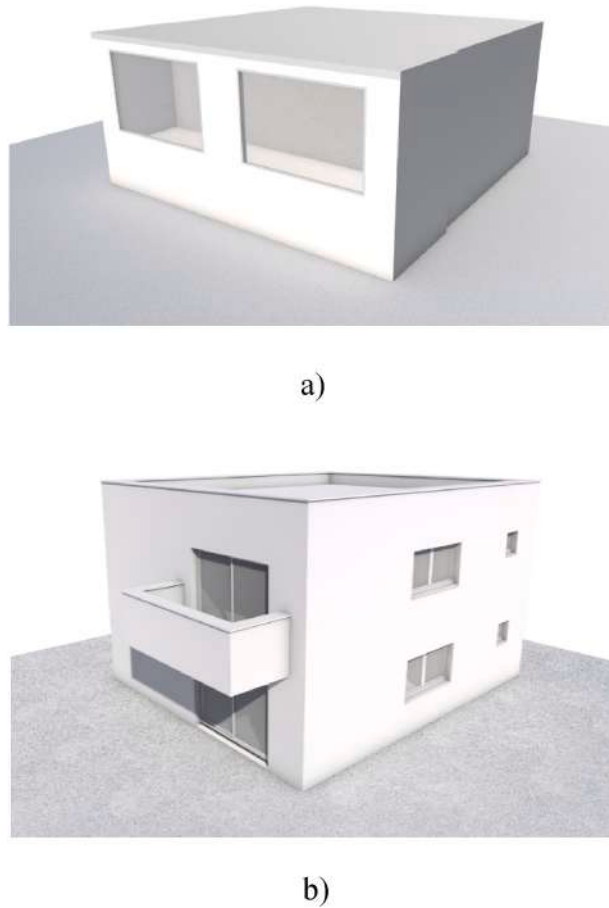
Archicad 3D models; a) simple building, b) multi-section building.
